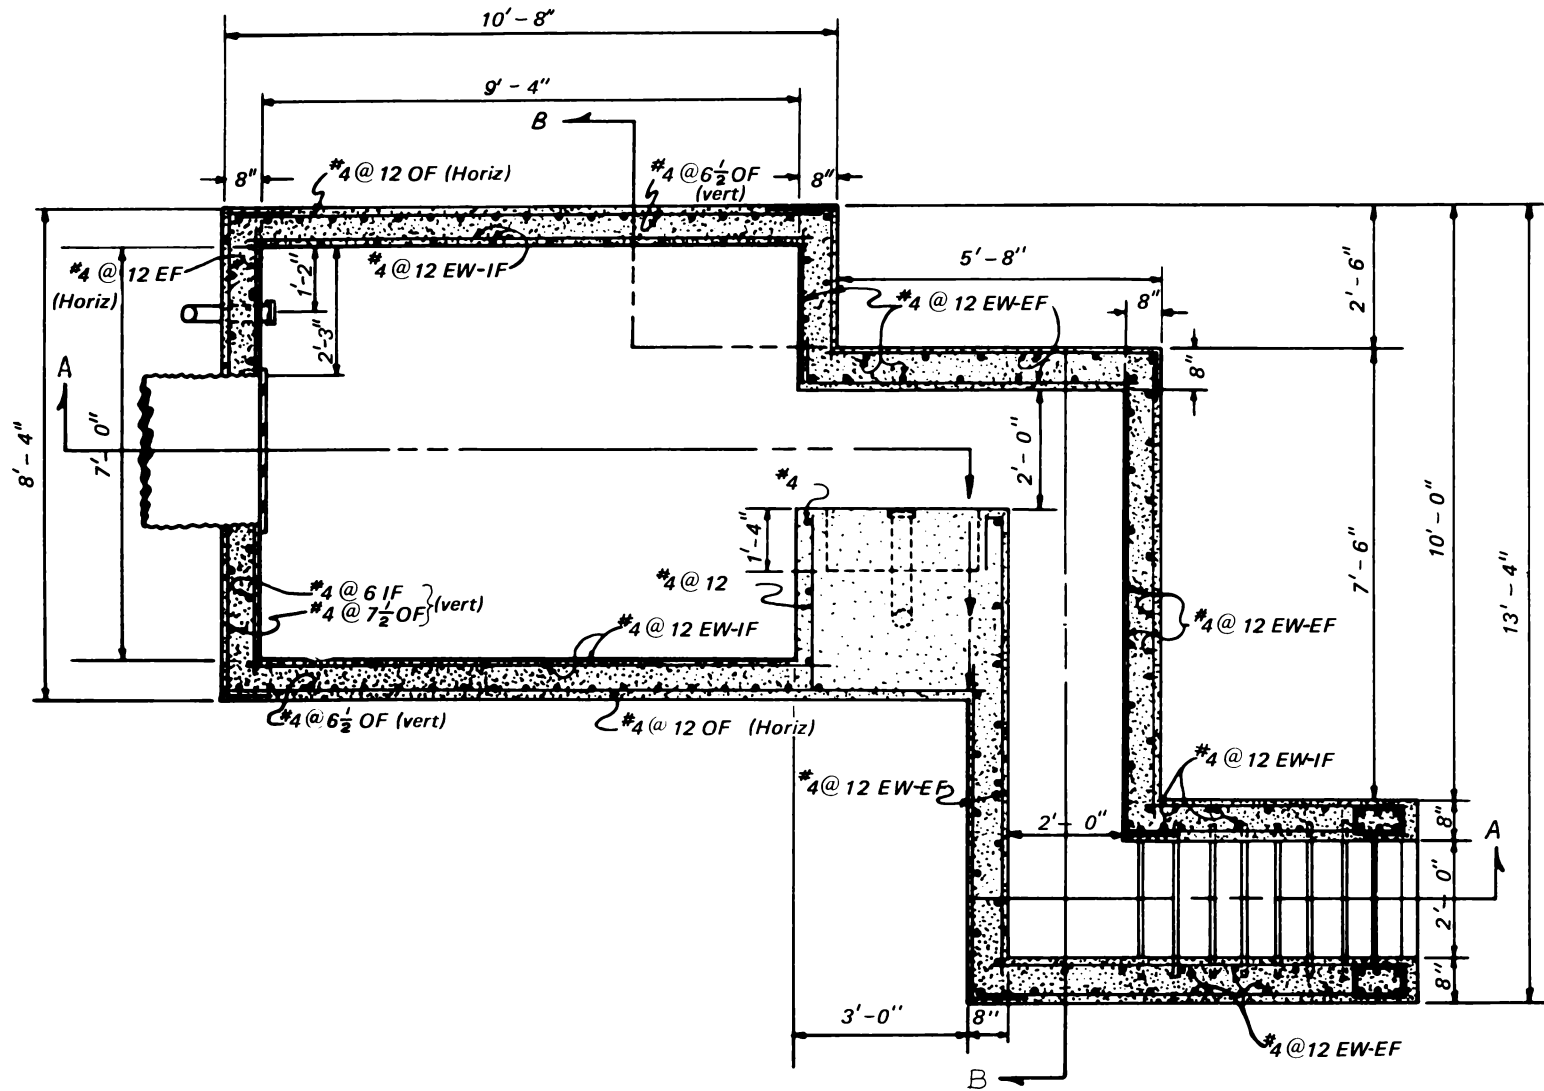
Floor plan of FCDA family shelter, Mark I.
